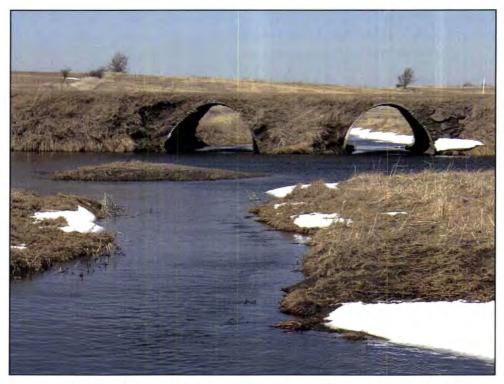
Downstream End of Firesteel Creek No. 19 Study Site
